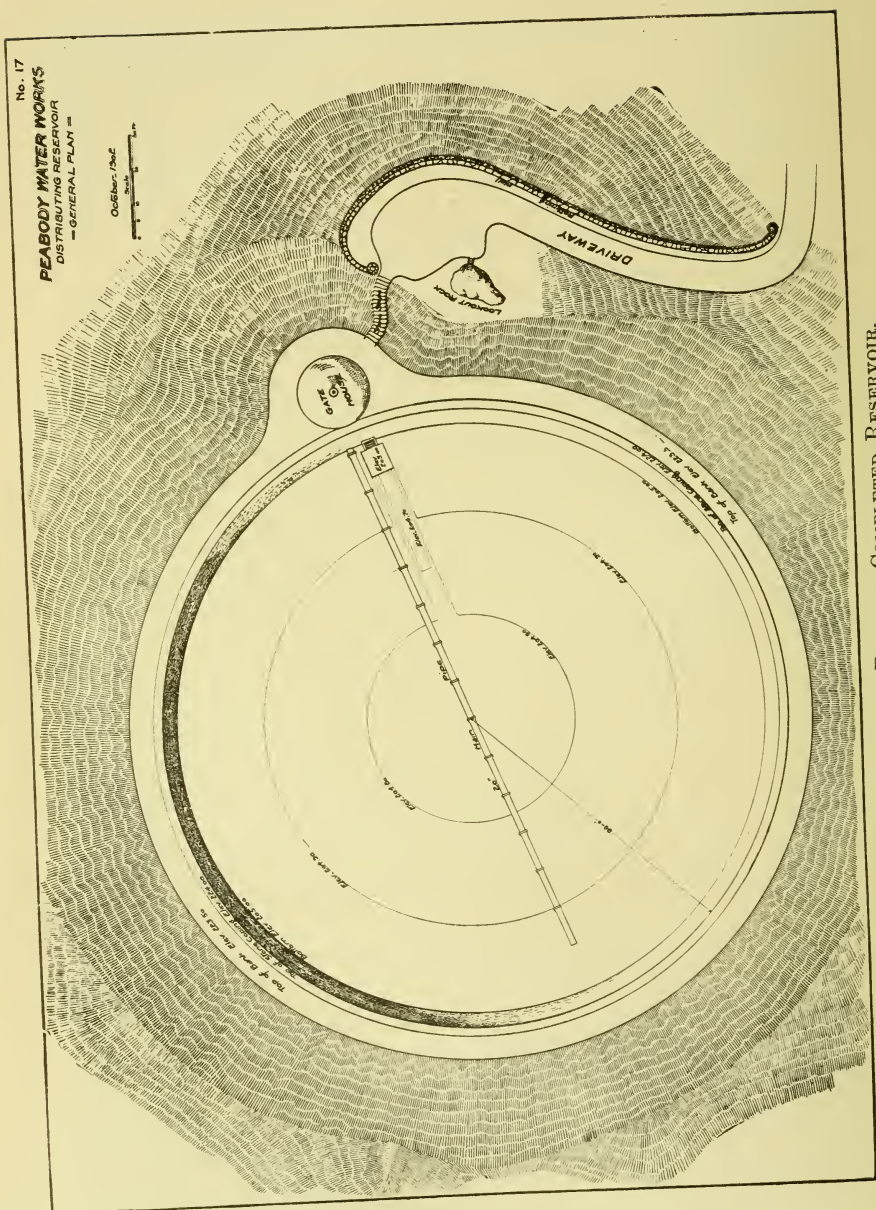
GENERAL PLAN OF COMPLETED RESERVOIR.
